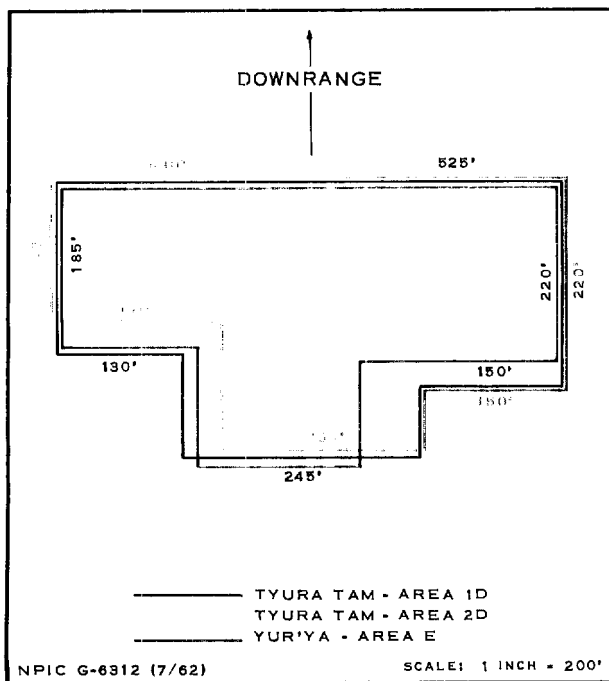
PLAN VIEW OF THREE EXCAVATIONS.
